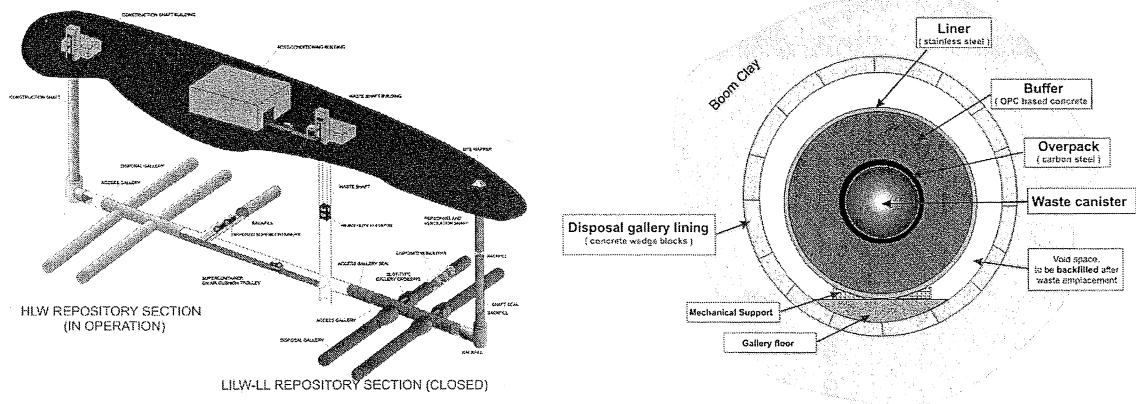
Cross-section in a disposal gallery for vitrified HLW
